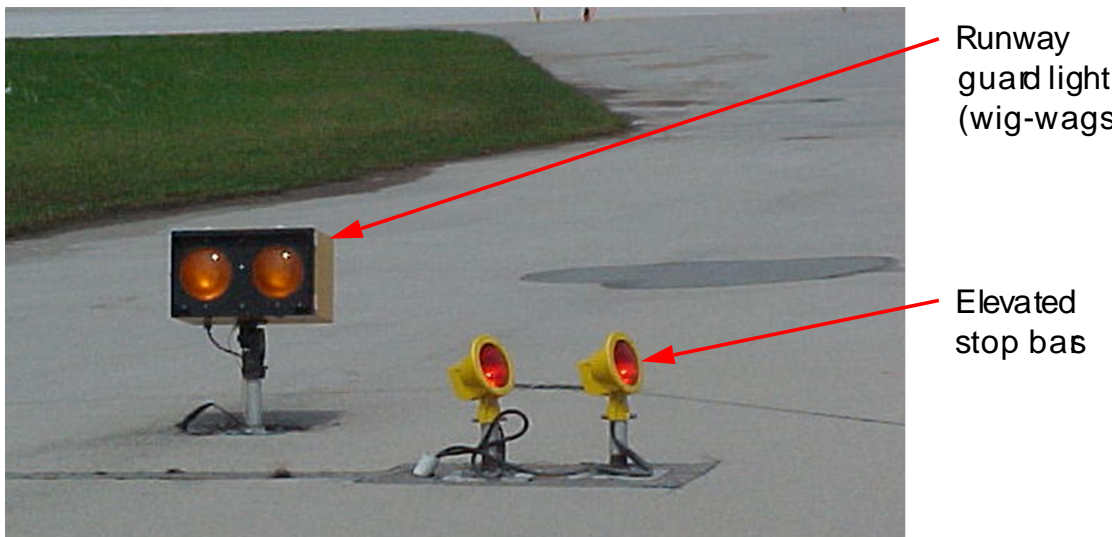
Elevated Stop Bars and Runway Guard Lights
